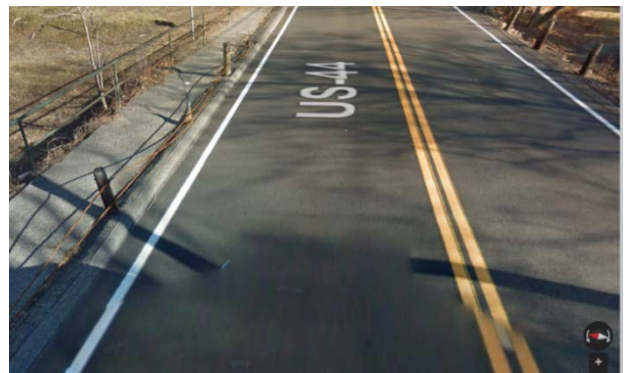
Damaged cable and wooden post guard rail on Greenwood Road East looking west, east of Maple Avenue
